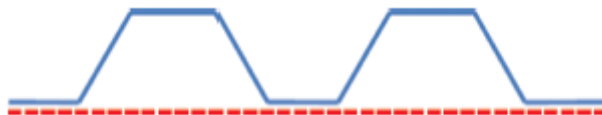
Failure interface of a sheet pile wall. Source: CUR211 (2013)
